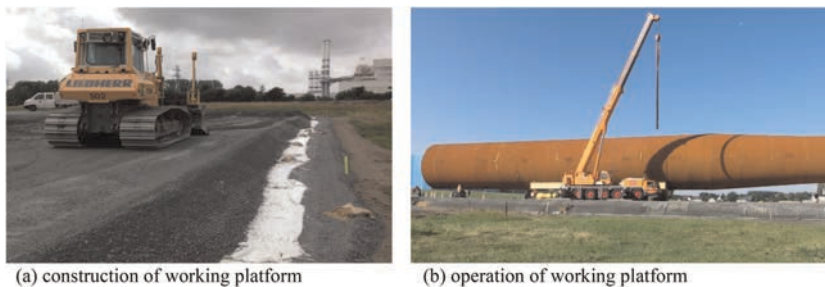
Geosynthetic reinforced working platform (Nordenham, Germany).
